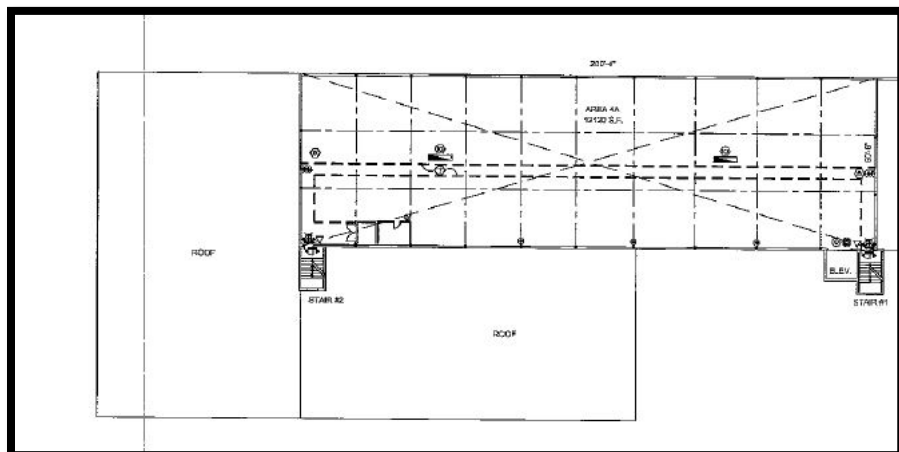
Grote Building Floor Four - only the 1925/1946 addition has a fourth floor.
